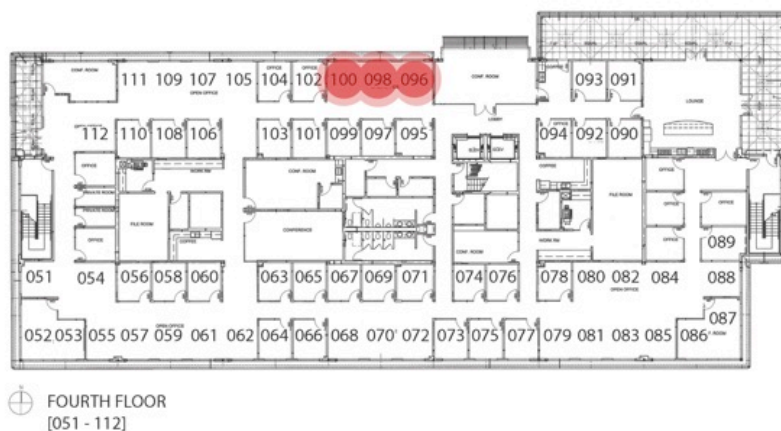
Offices # 096, 098, and 100 shown on the keyed fourth floor plan.
